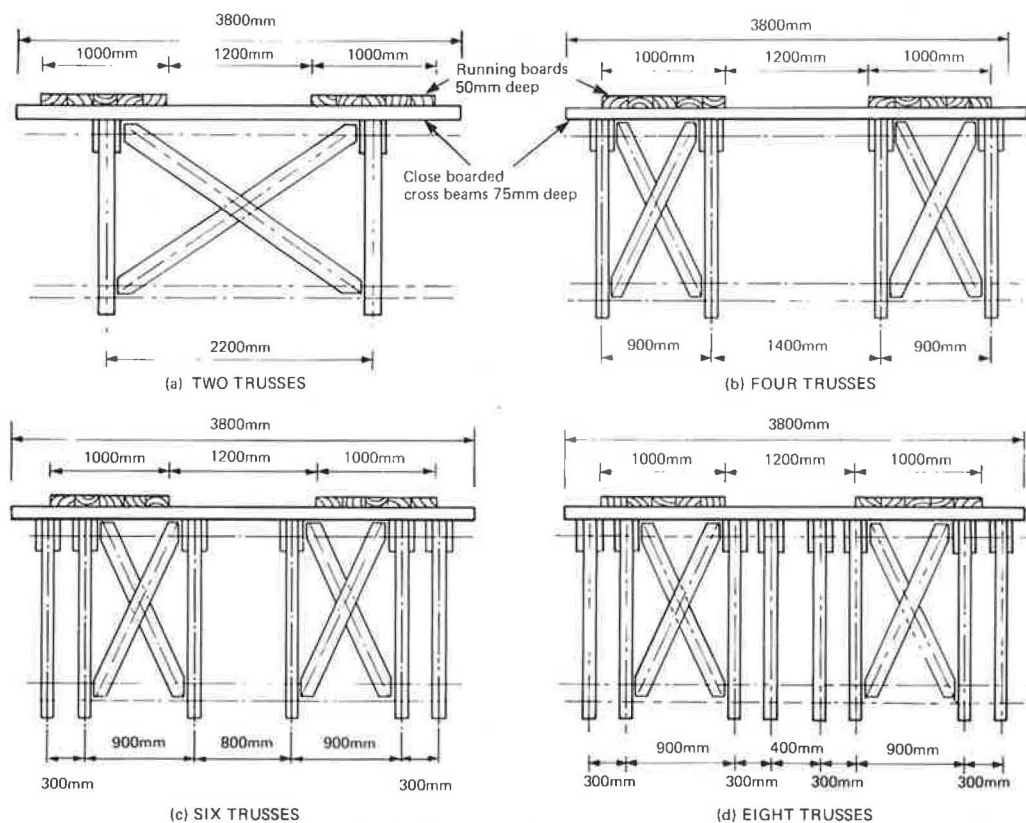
Typical cross-sections using (a) 2 trusses, (b) 4 trusses, (c) 6 trusses, and (d) 8 trusses.
